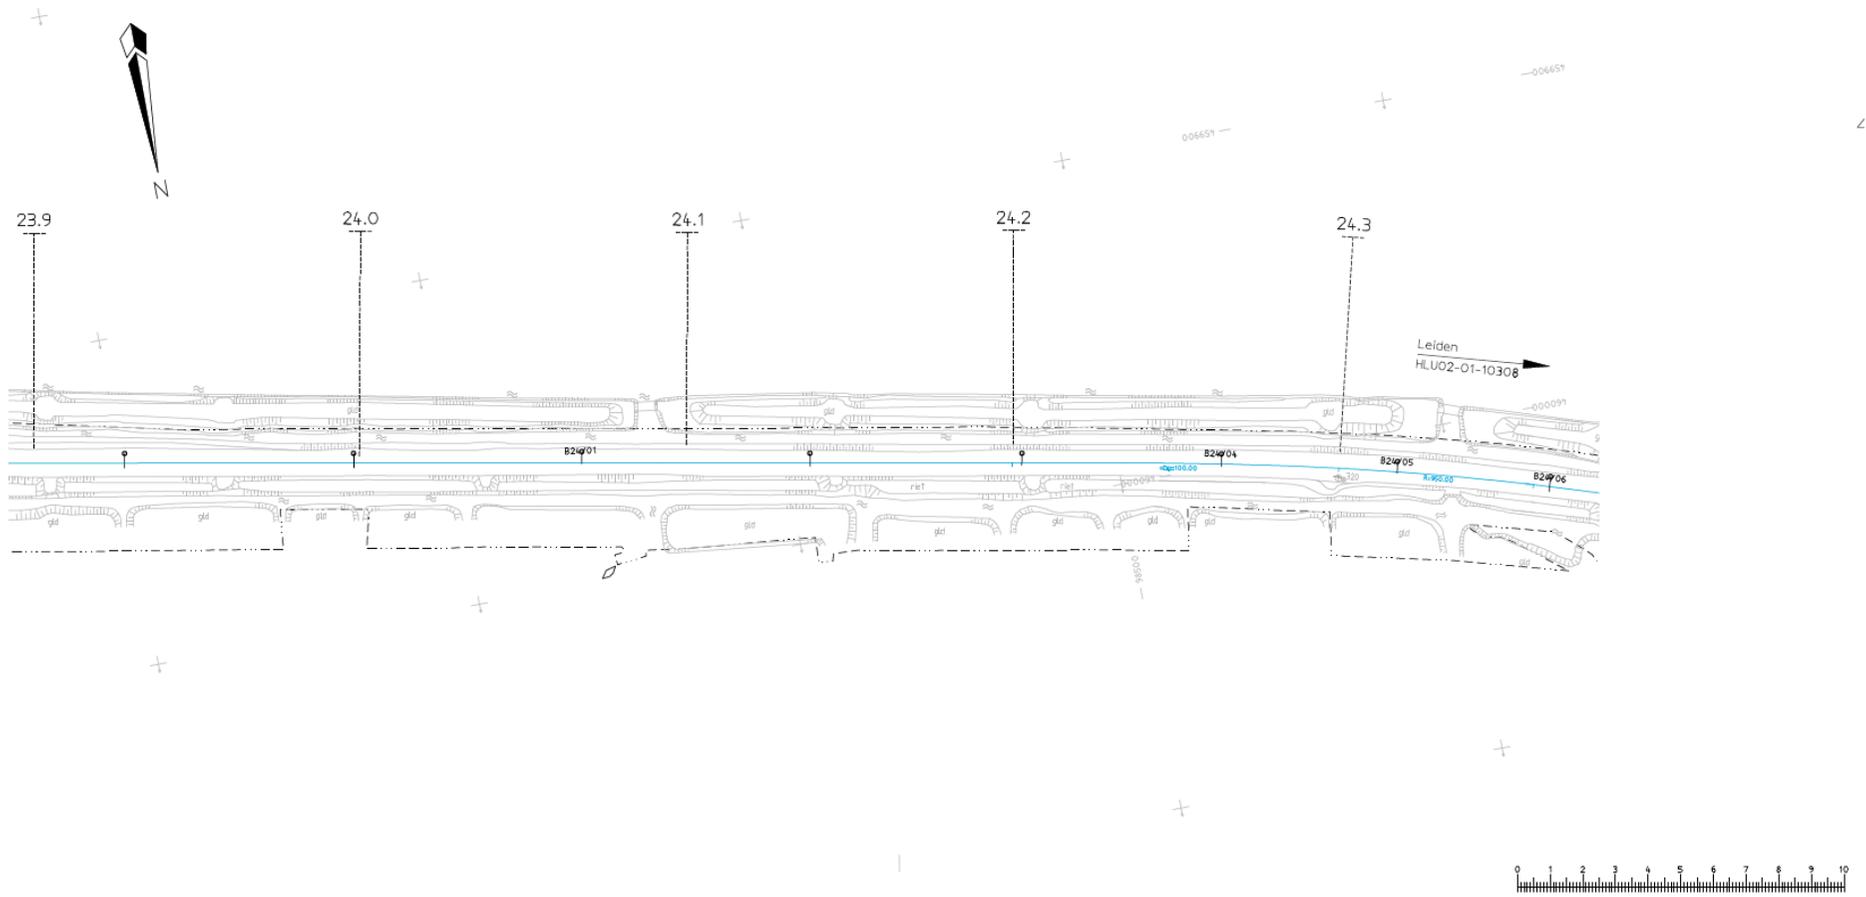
Top View Railway Embankment between km 23.9 – 24.3 (Arcadis, 2016)
